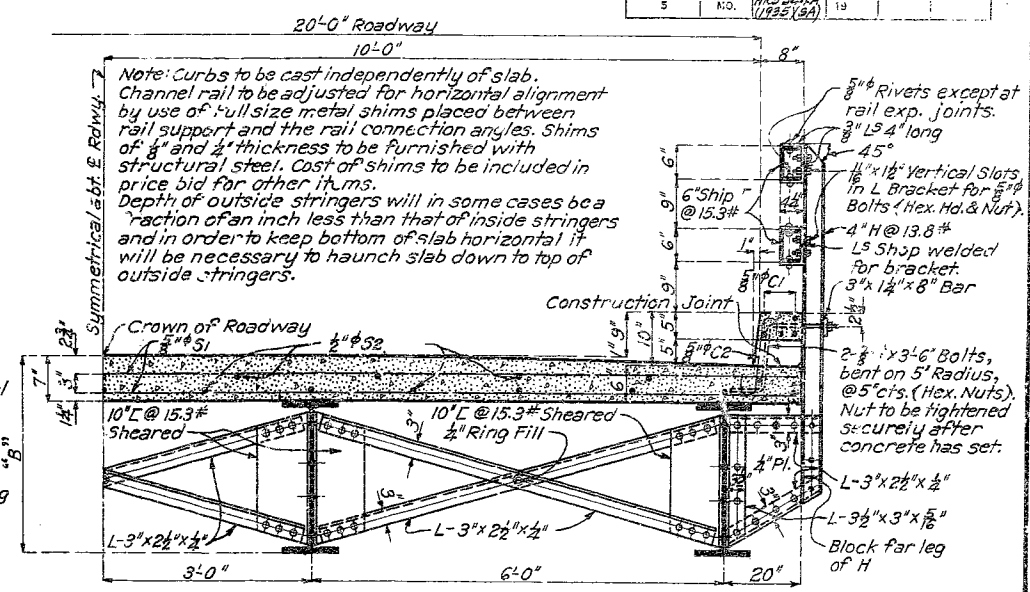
DETAIL OF RAIL BRACKET AT ENDS OF SPAN
